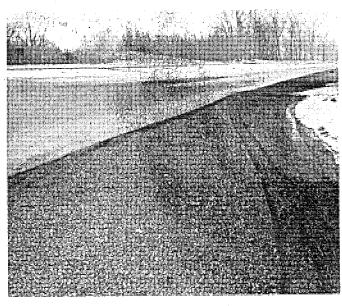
Resurfacing. In an area at least a full lane in width, (a) the covering-over with or without the removal of the existing pavement, or (b) removal and replacement of all existing pavement with portland cement concrete, bituminous concrete, tar and chip mix, or other materials.
